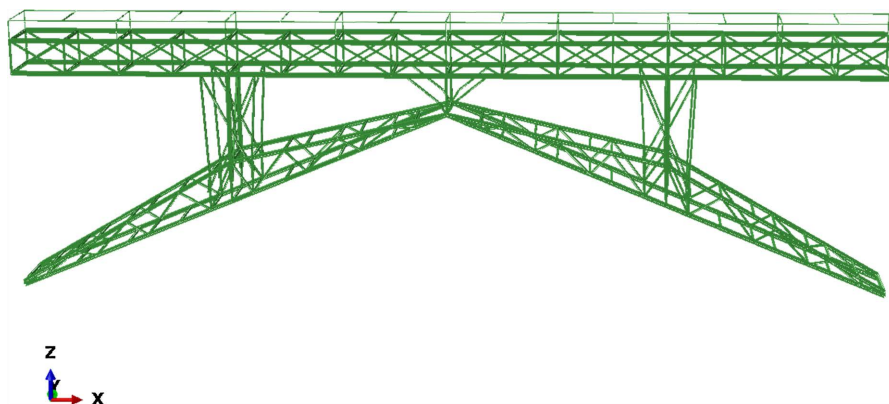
Three-dimensional finite element model of the herringbone triangular truss arch bridge
